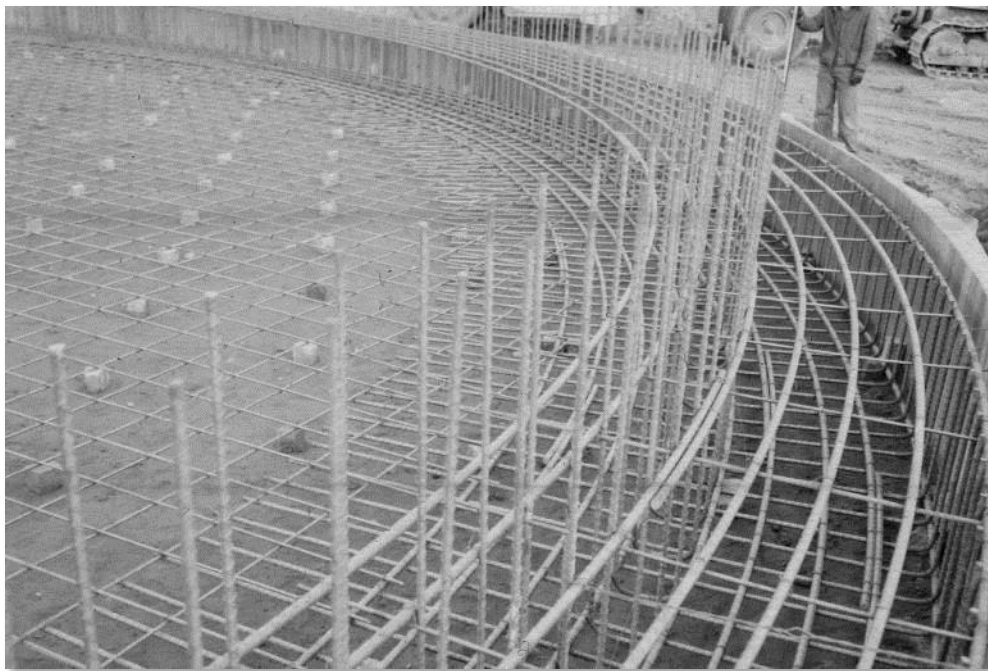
Placement of Reinforcing Steel in Base Showing Wall Dowels in TX Tank Farm (RPP-PLAN-61510)
